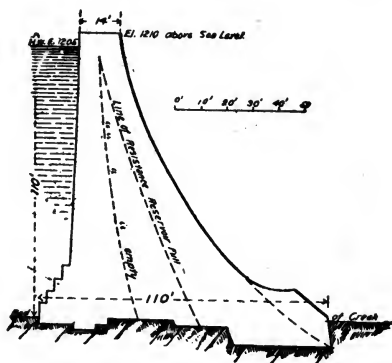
CROSS-SECTION OF BEETALOO DAM, AUSTRALIA.
